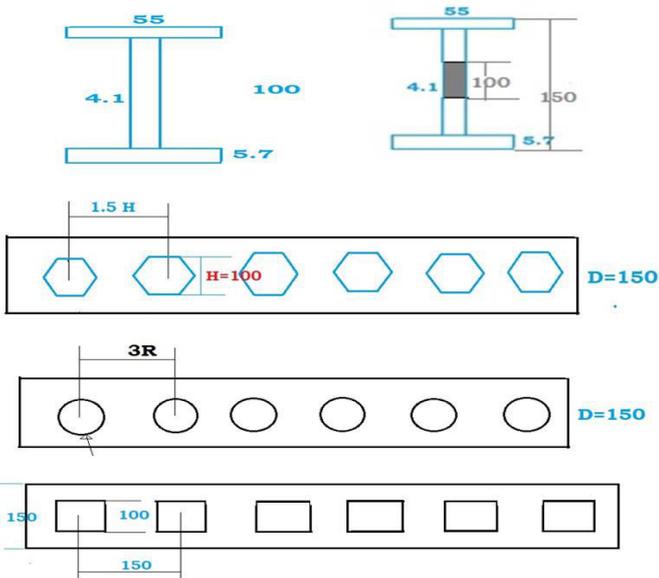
Dimension of standard ISMB 100 dimension after corrugation
